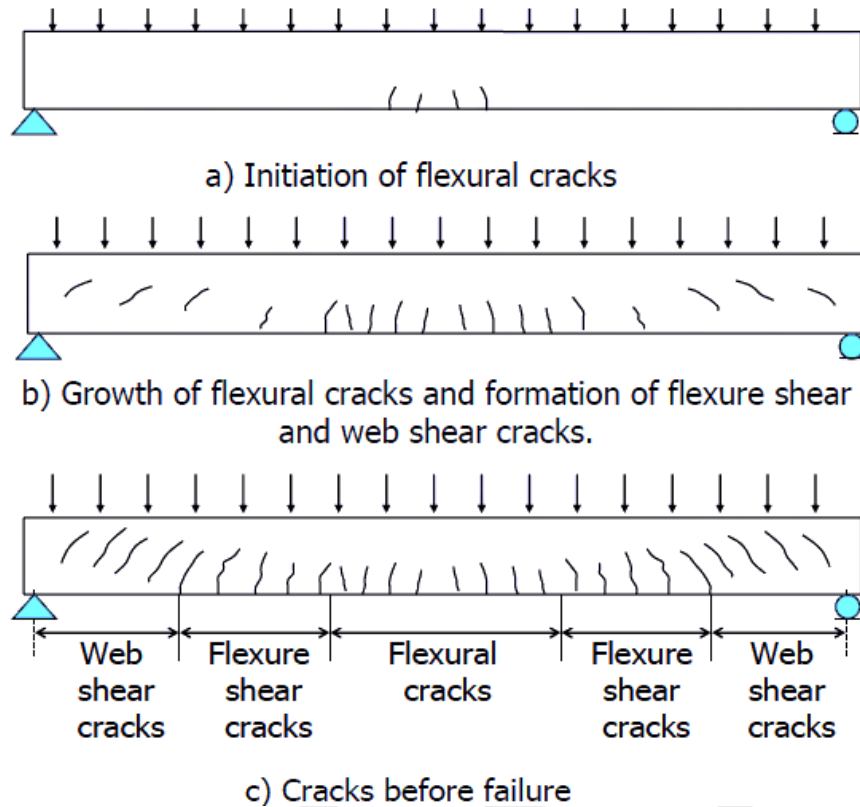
Formation of cracks in a reinforced concrete beam
